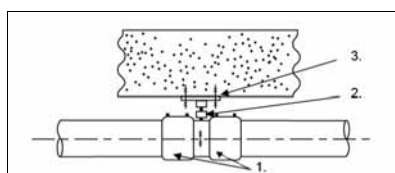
Anchor bracket with 2 Akafusion couplers Art. Nr. 41xx95
